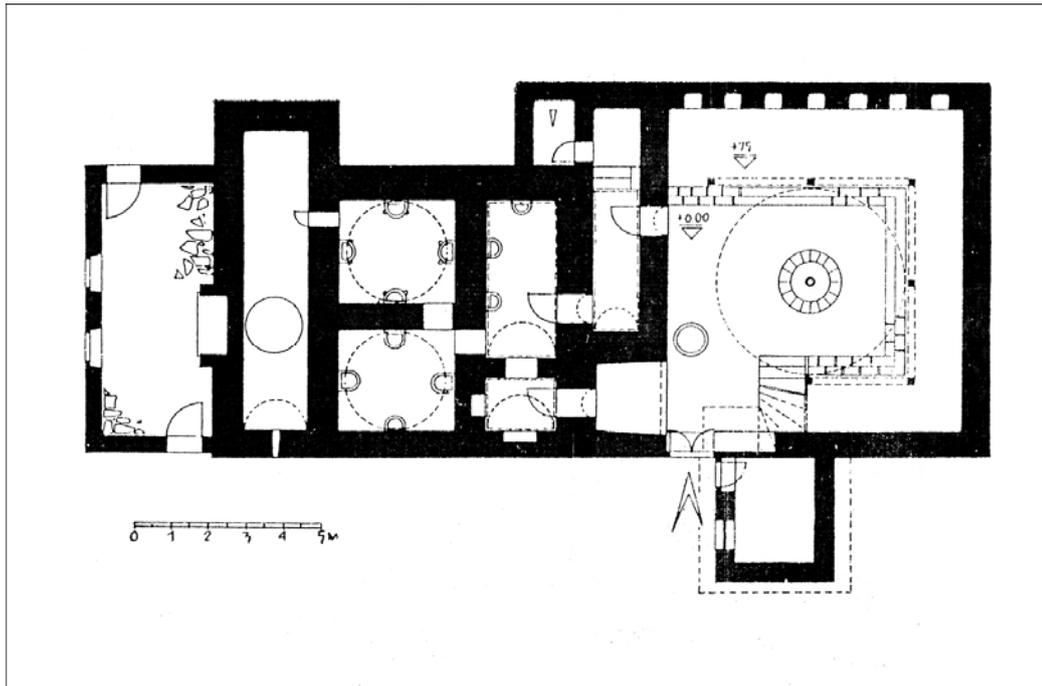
Floor plan of the 16th-century public bath in Karlova (plan D. Popov)
